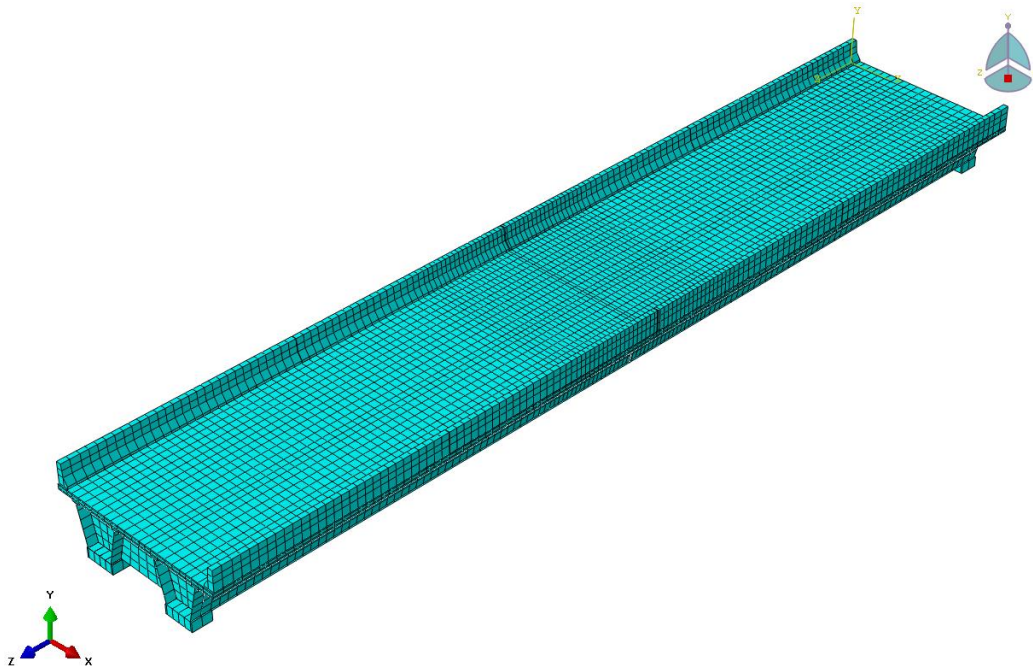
Typical finite element model of twin steel box girder bridge.
